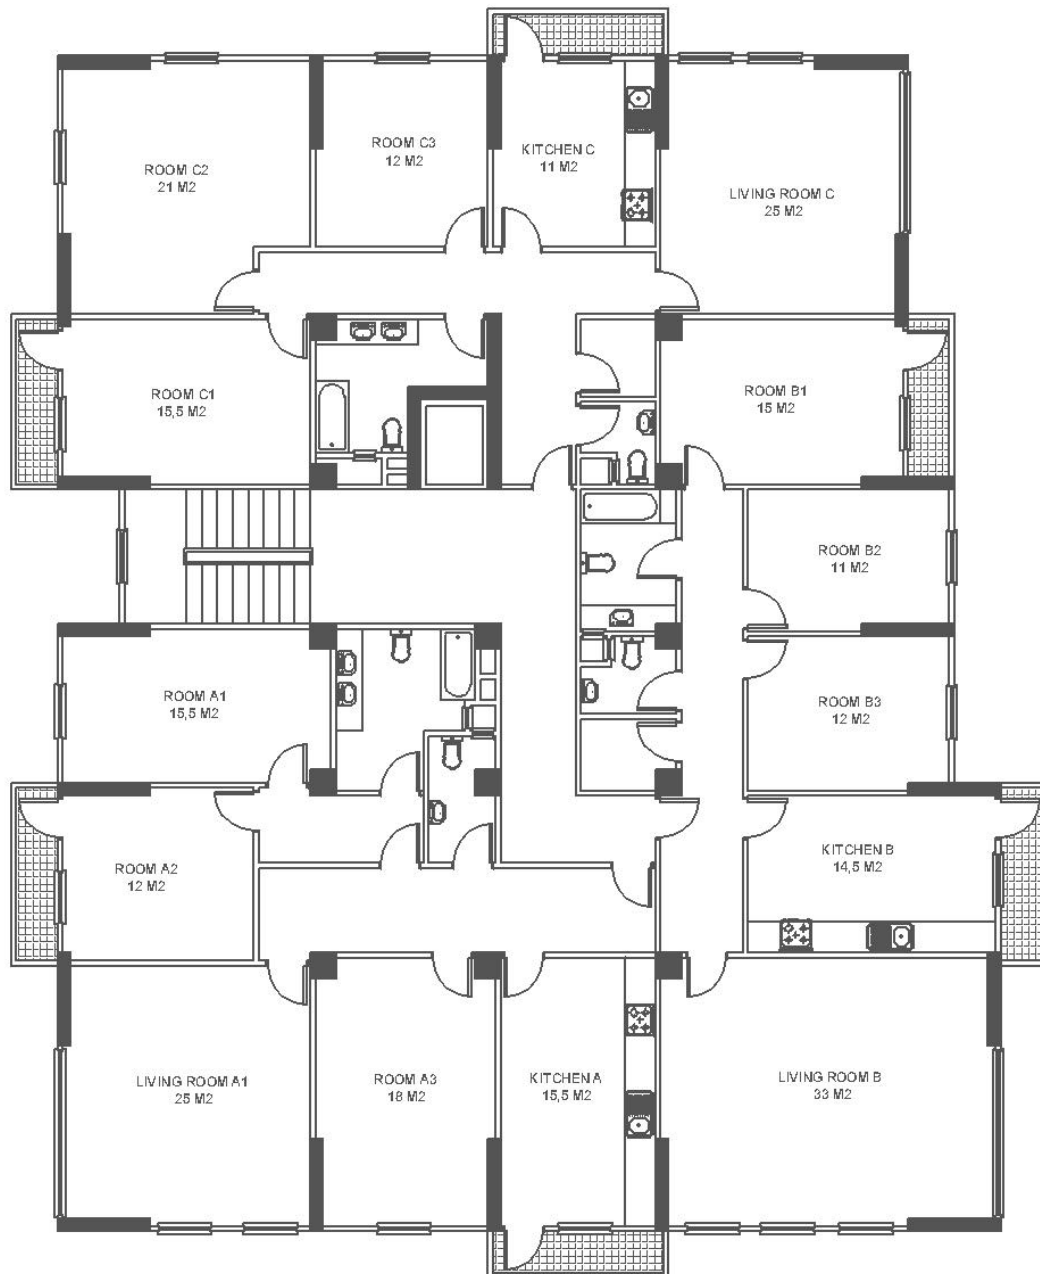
Architectural Plan of Model-2 with Regular Structural System
